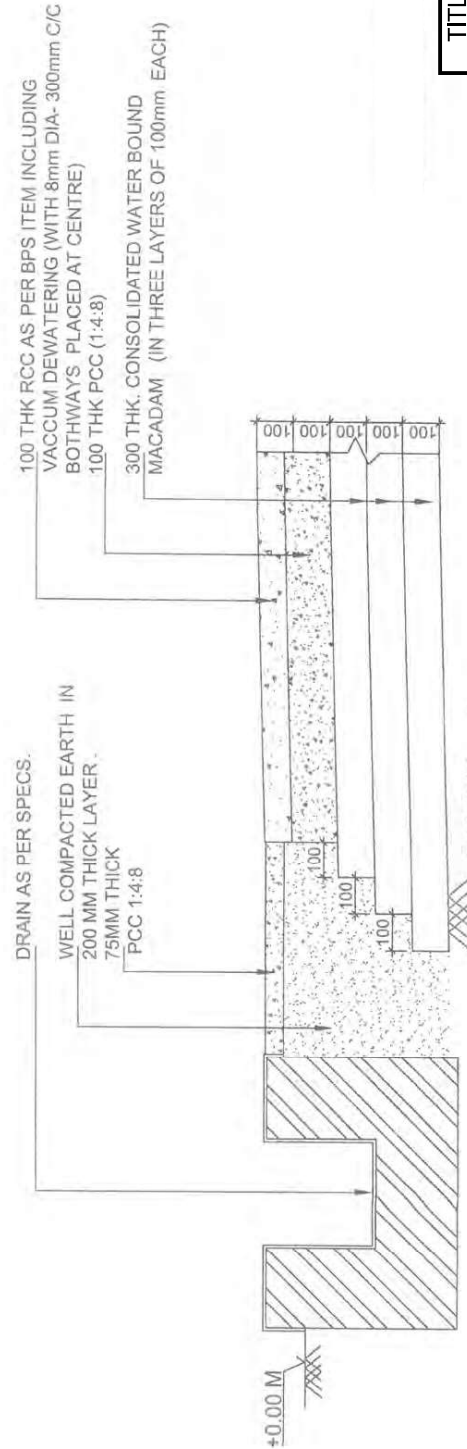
DETAIL OF CONCRETE ROAD (RIGID PAVEMENT)
